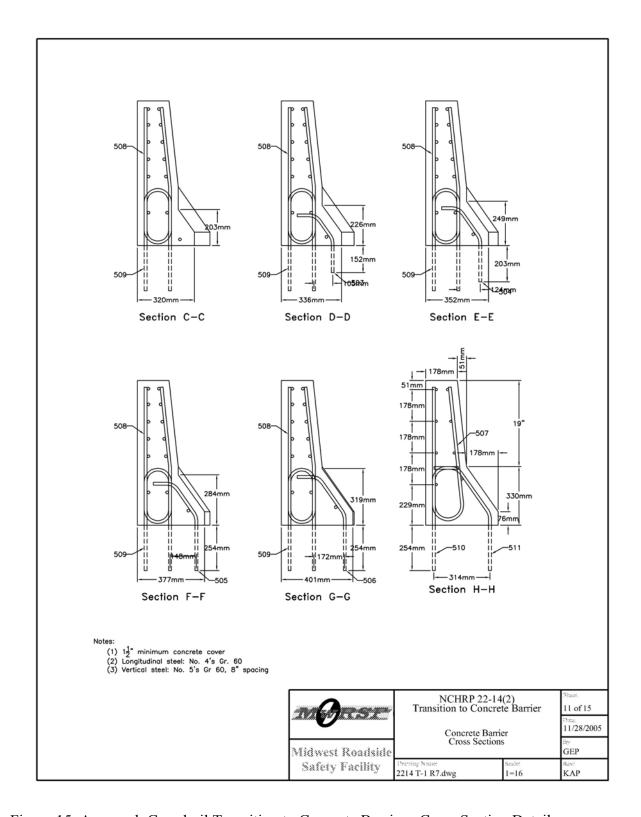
Approach Guardrail Transition to Concrete Barrier - Cross Section Details
